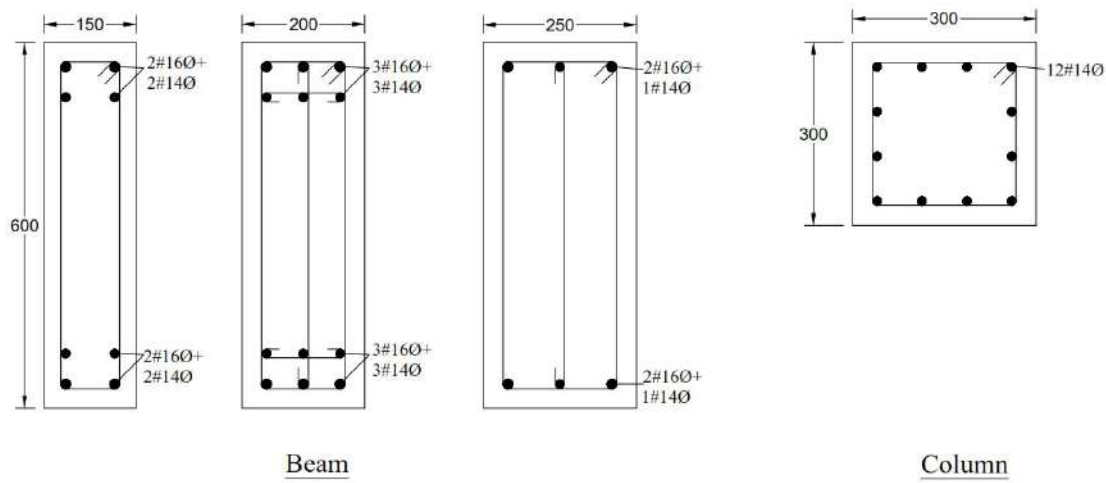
Details of reinforcement bars in beams and columns (all dimensions are in mm)
